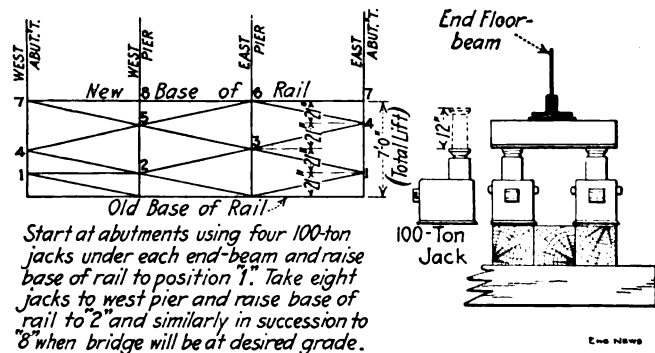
DIAGRAM SHOWING THE SERIES OF LIFTS IN RAISING THE THREE-SPAN BRIDGE TO ITS NEW ELEVATION
